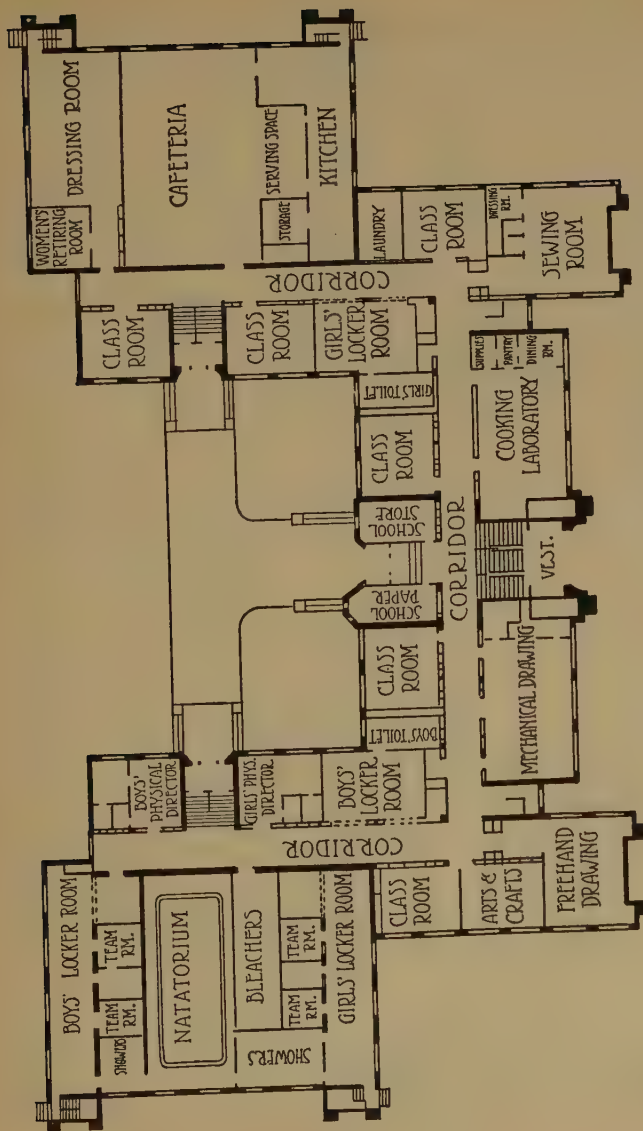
Ground-floor plan of the senior high school, Dubuque, Iowa
